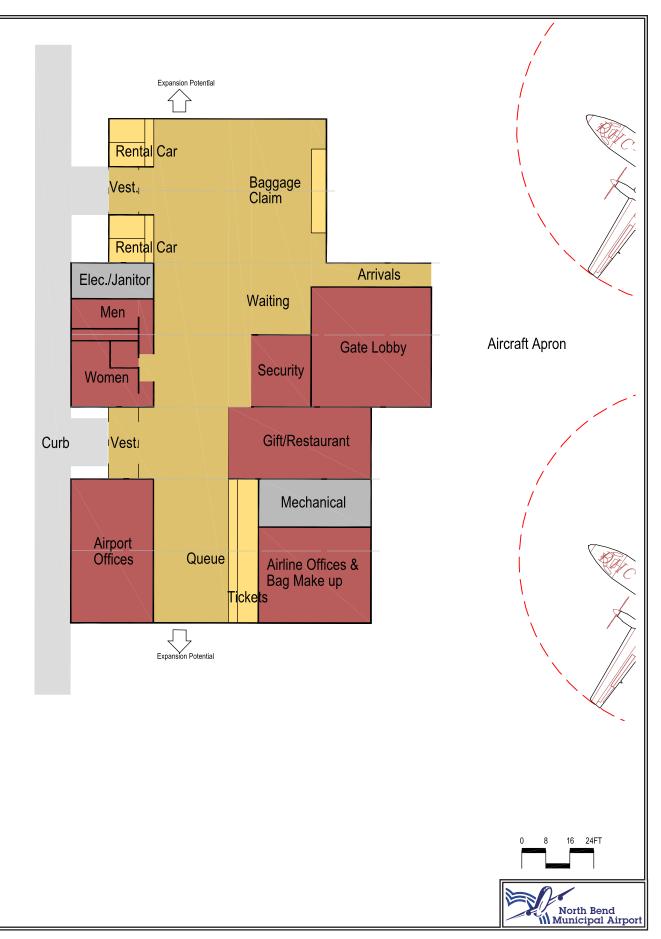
C TERMINAL AREA ALTERNATIVE 2 AT THE EXISTING HANGAR
